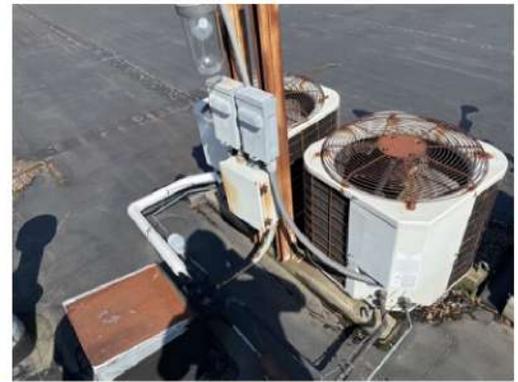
Roof, West Addition, SE Area, All Electrical Insulators in Safety Switches are Assumed to Contain Asbestos
